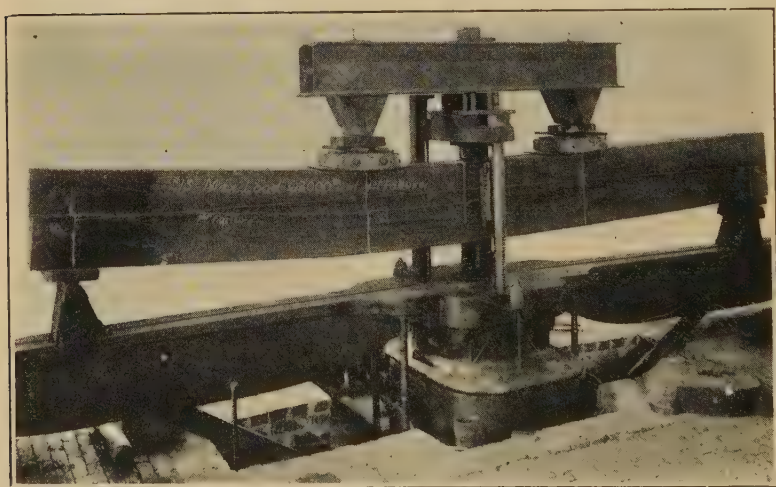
Large beam in testing machine. First failure was in horizontal shear.
